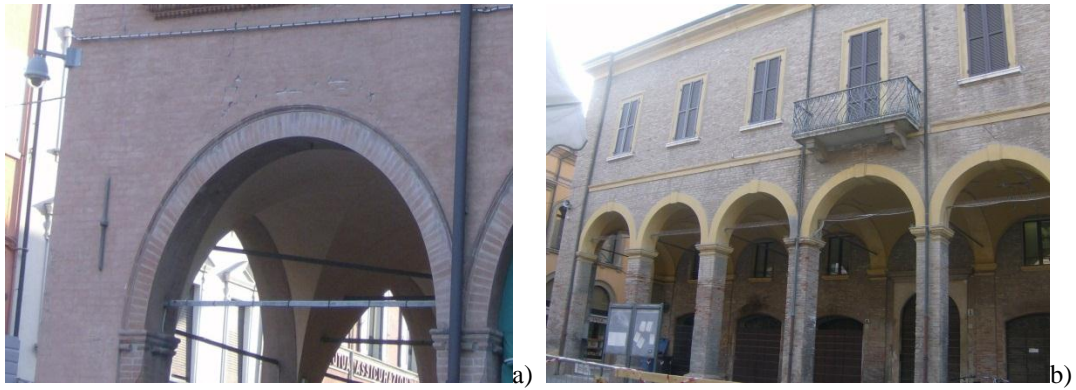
a) *Metallic elements and anchors in the arches of the façades of the building on the corner between Costituente Square and Felice Cavallotti street in Mirandola* b) *Anchors in the arches of the façade in Cesare Battisti street in Mirandola.
